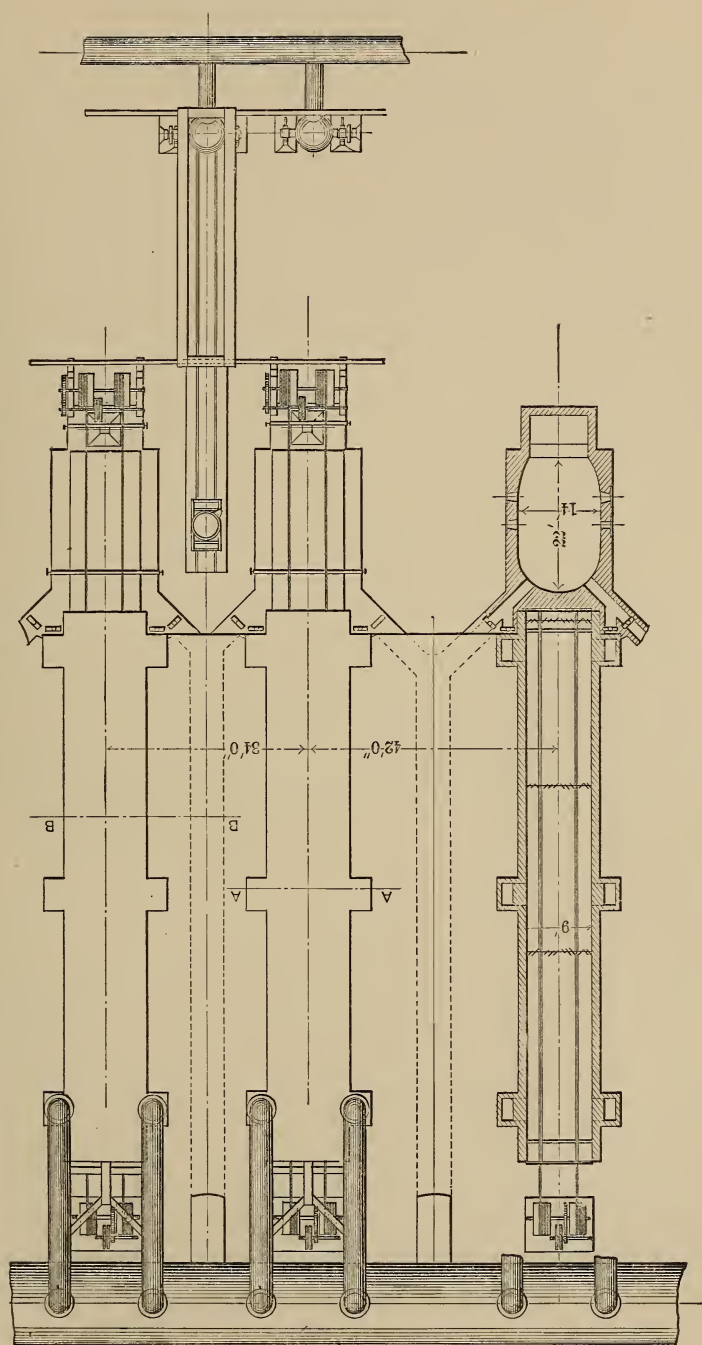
PROPOSED COMBINATION OF ROASTING, SMELTING, AND CONVERTING PLANTS; PLAN.
